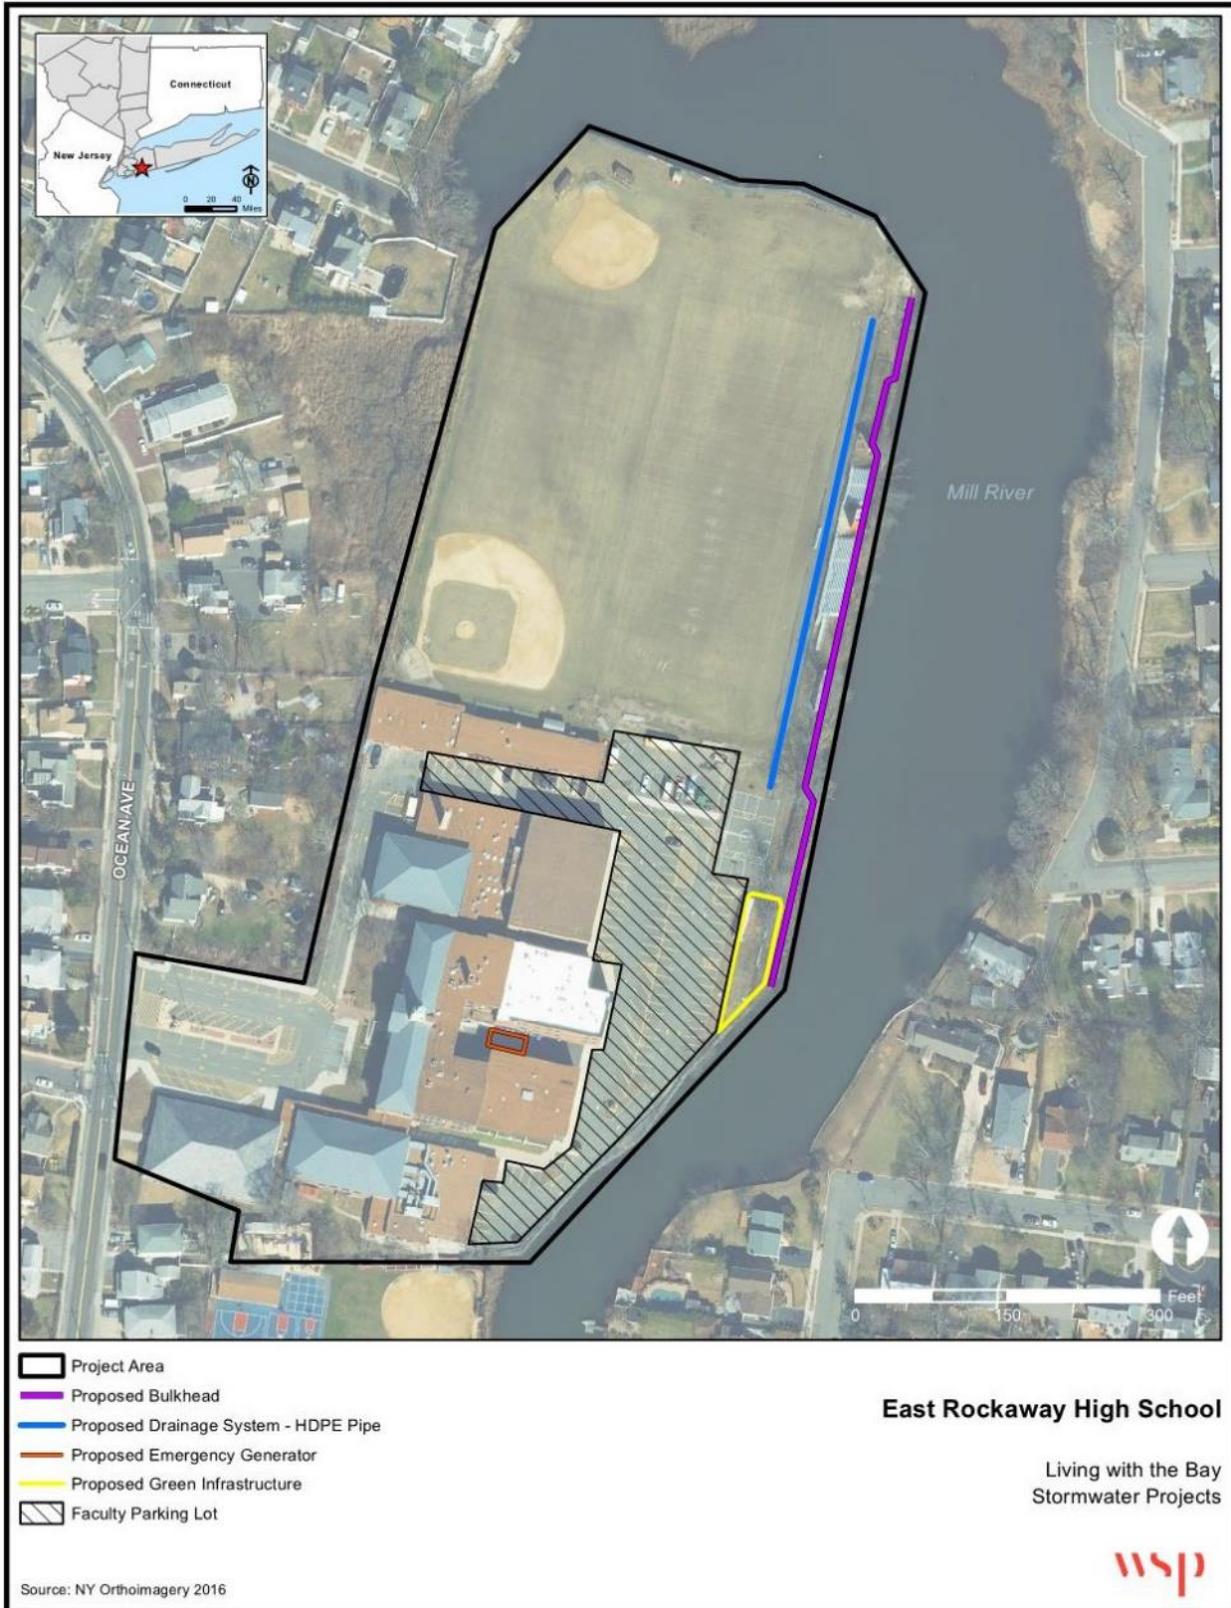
East Rockaway High School Proposed Improvements Site Plan
